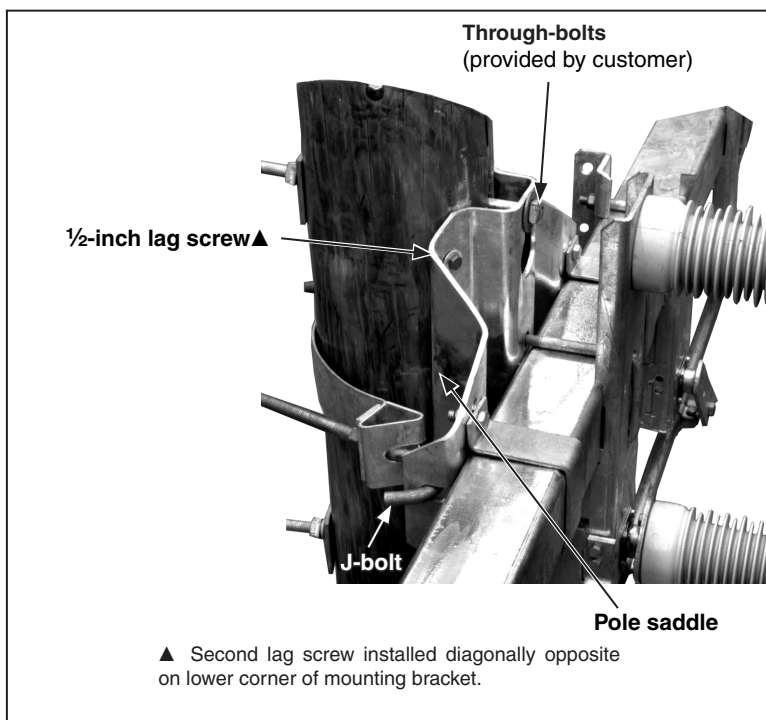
Typical pole-band attachment detail (vertical mounting configuration illustrated).
